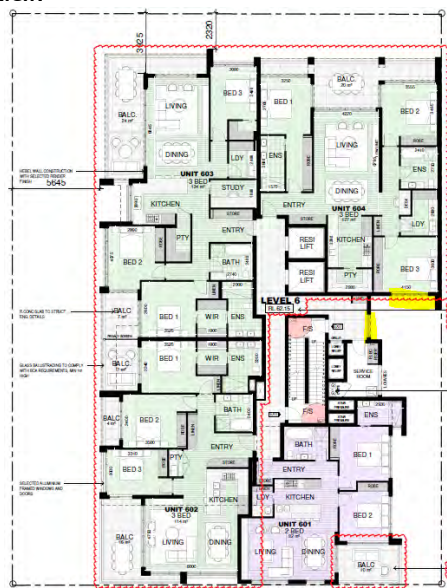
Extract of level 6 floor plan showing bedroom window highlighted in yellow which is on an oblique angle to the common circulation area window also highlighted in yellow
